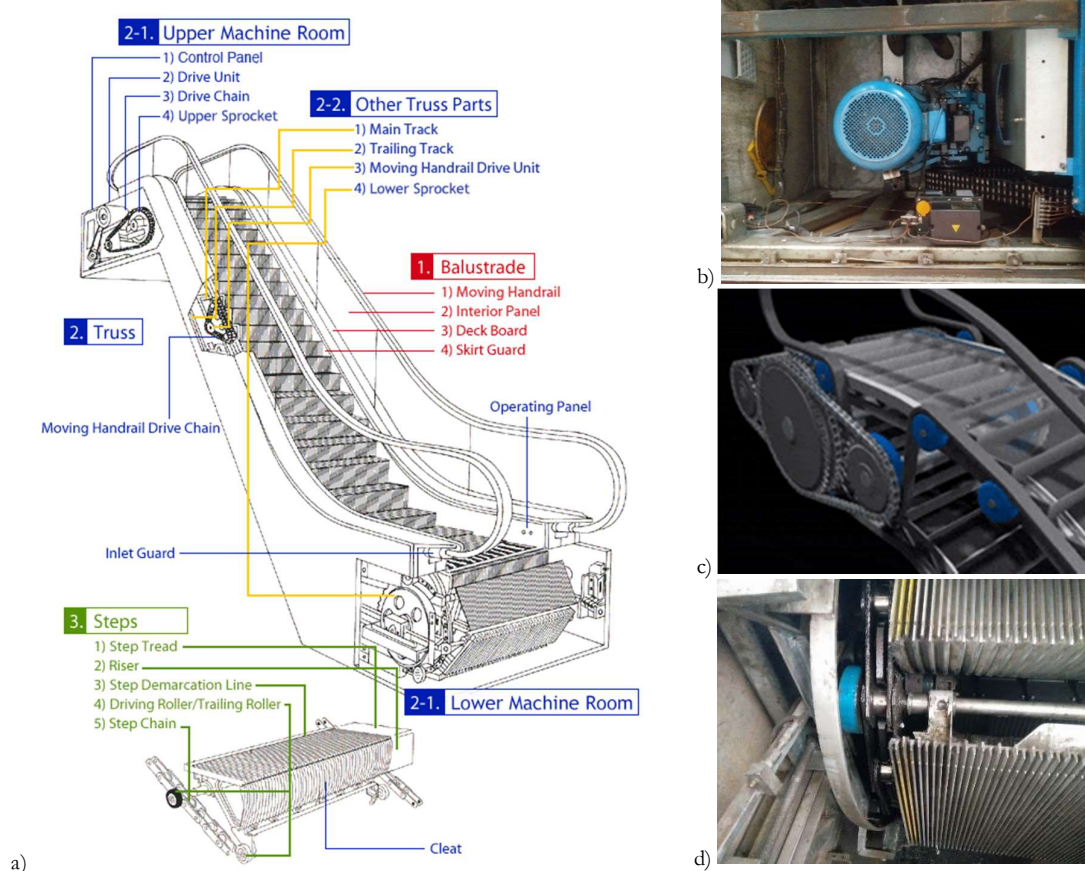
a) Elements of an automatic escalator [3] b) Upper machine room: Drive and chain-to-upper sprocket transmission c) Detail of dynamic system [4] d) Lower machine room: guiding rail of trailing roller
